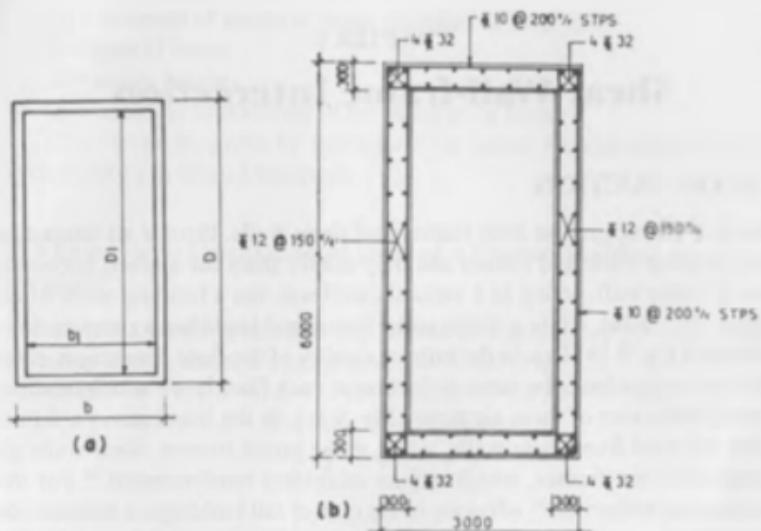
Design of shear core. (a) Plan of hollow core; (b) Steel arrangement of hollow core.
